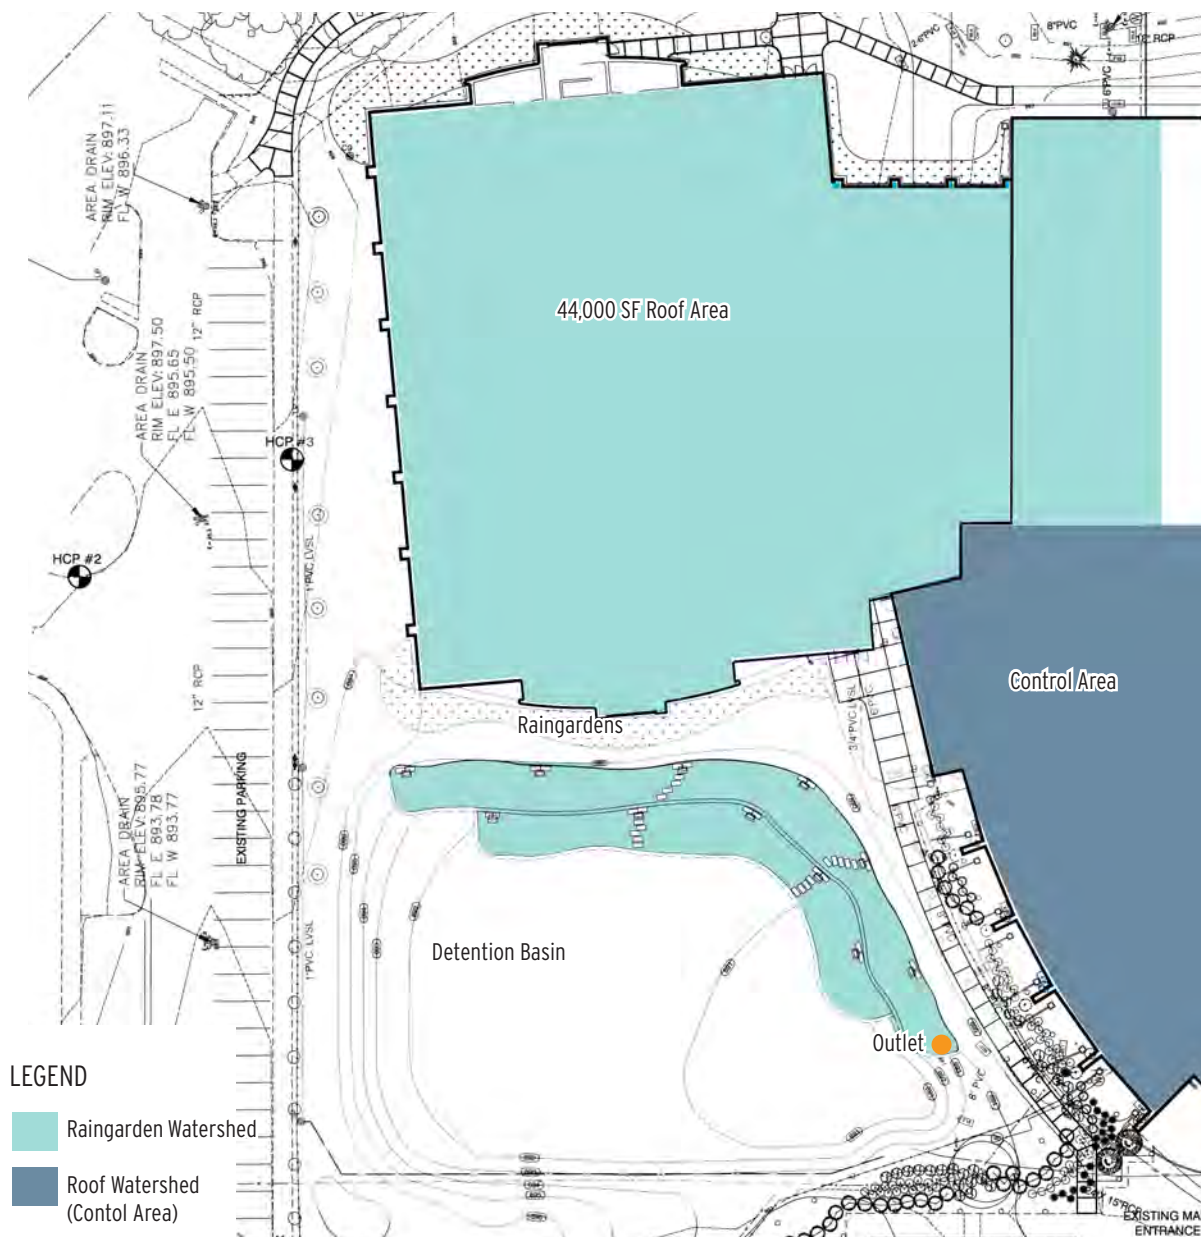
Watershed - Building Roof Drainage to Detention basin
